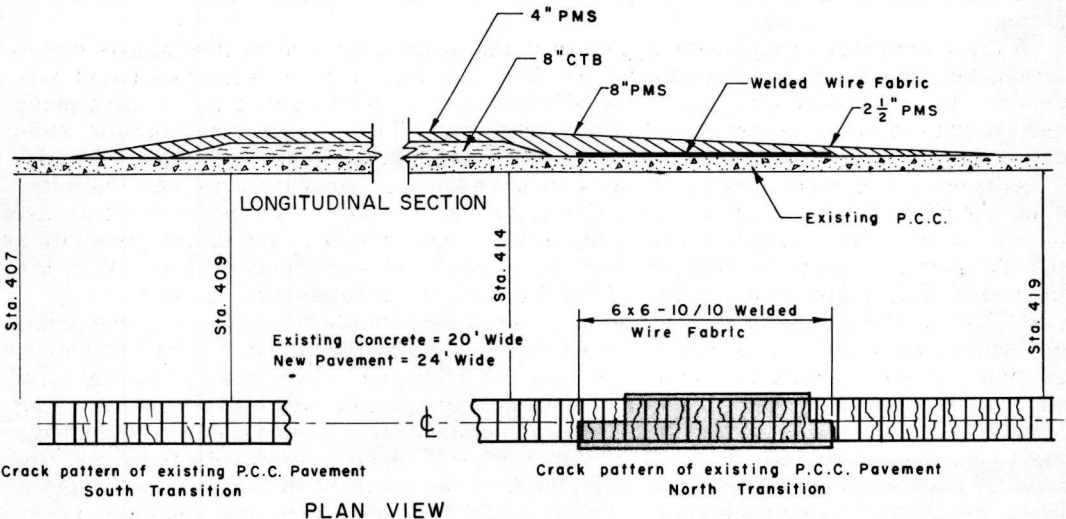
Welded wire fabric test section V - SB - 2 - D, C.
